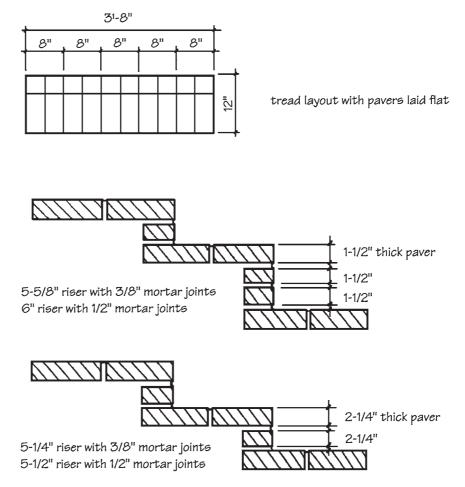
Brick steps using flat pavers. (From Beall, Masonry and Concrete for Residential Construction, McGraw-Hill Complete Construction Series, 2001.)
